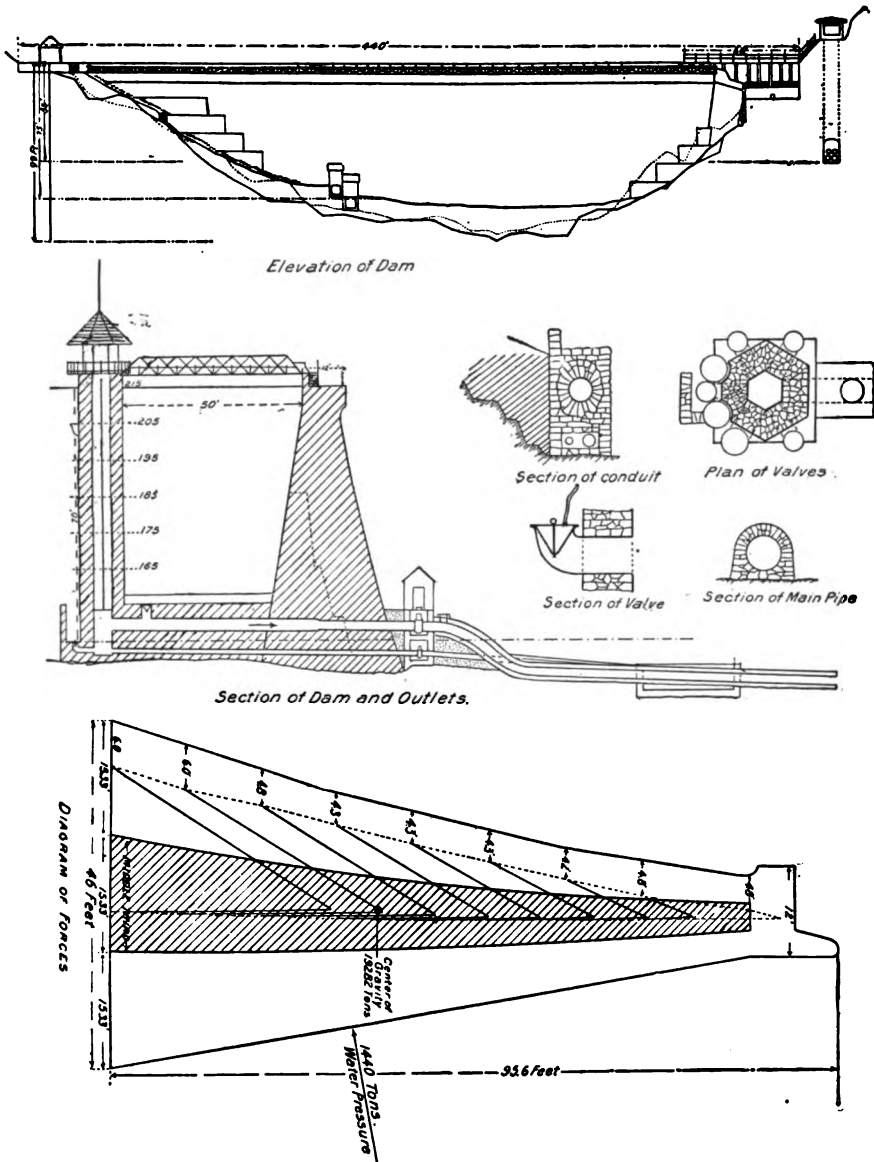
ELEVATION AND SECTIONS OF SWEETWATER DAM.
